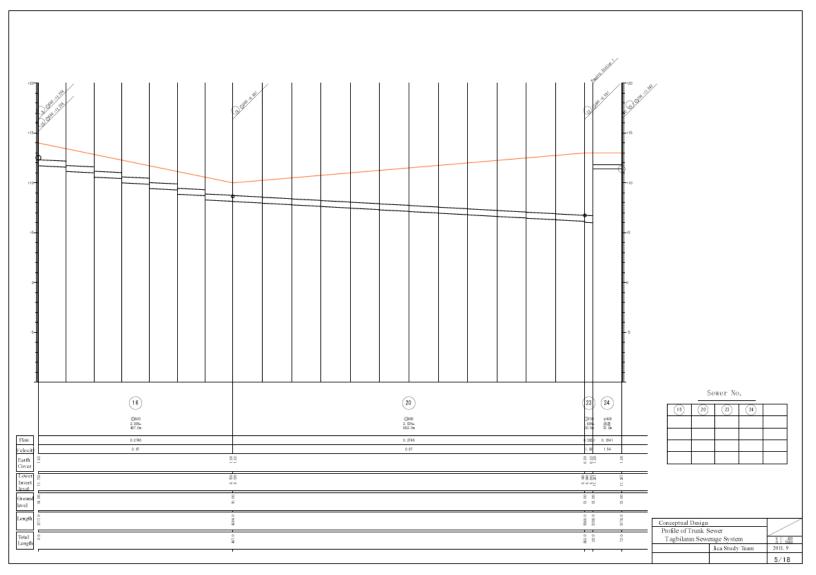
Profile of Trunk Sewer (Tagbilaran Sewerage System)
